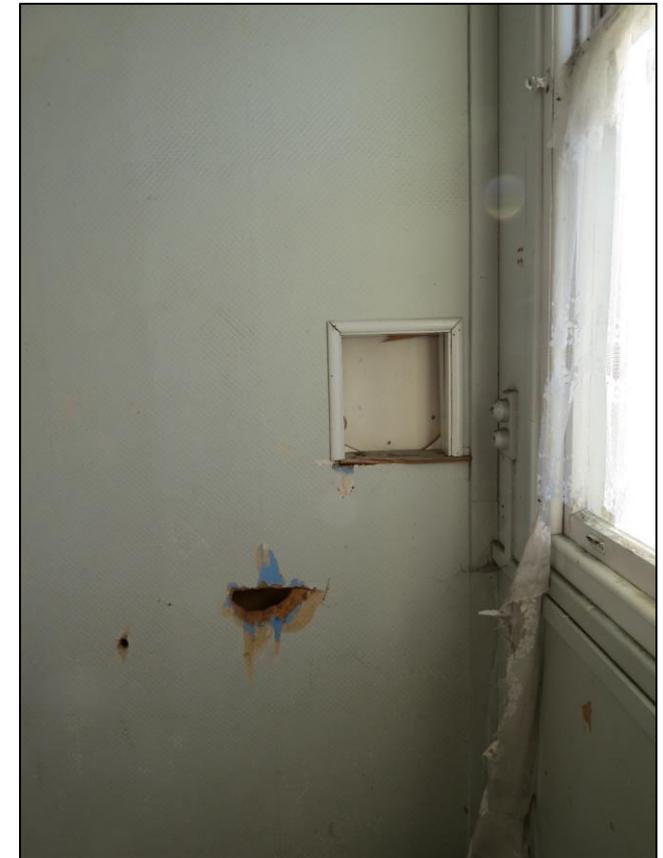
Room 56, detail of internal wall with service hatch, facing west
